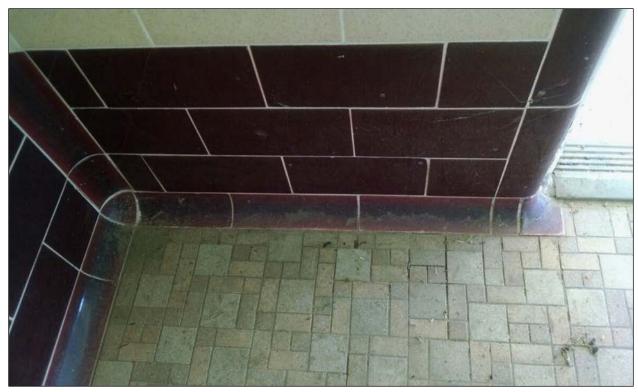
Ceramic wall tile in boys' bathroom; floor tile is probably a replacement.
